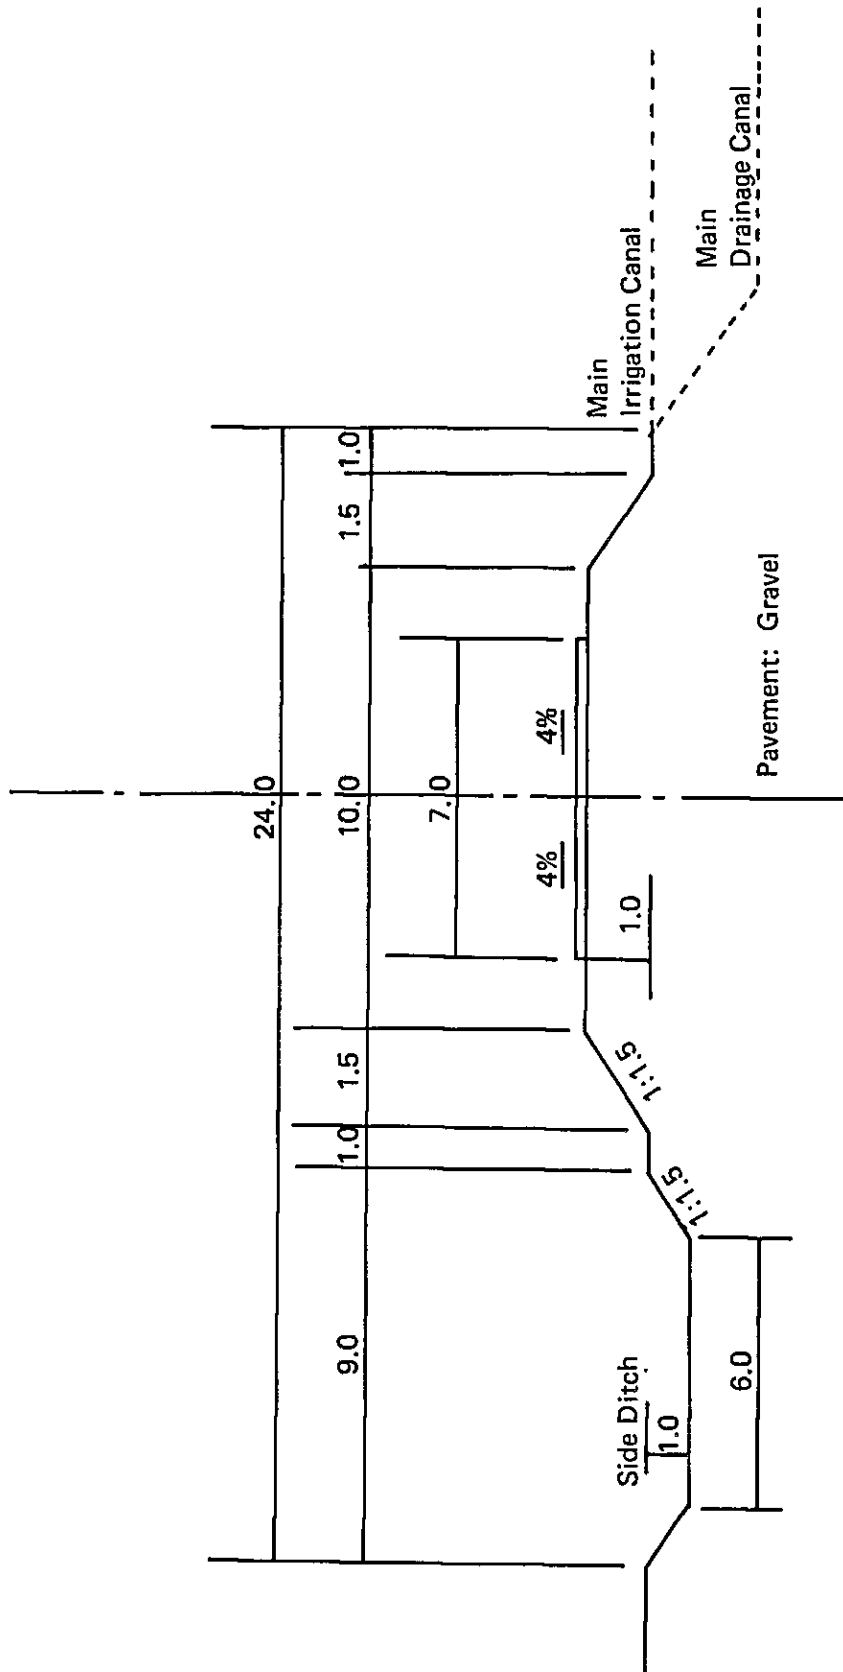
Main Road Standard Section (Unit: m)
